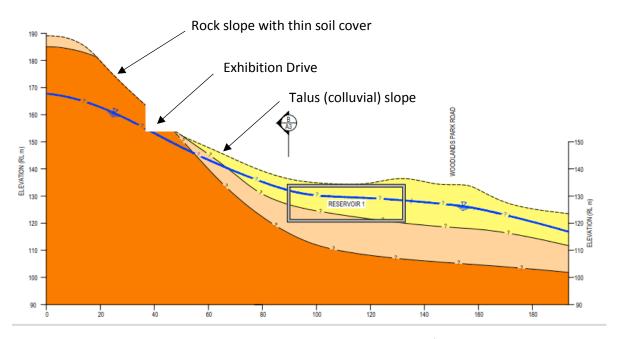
Geological section showing the escarpment located north of the Reservoir No. 1 site
